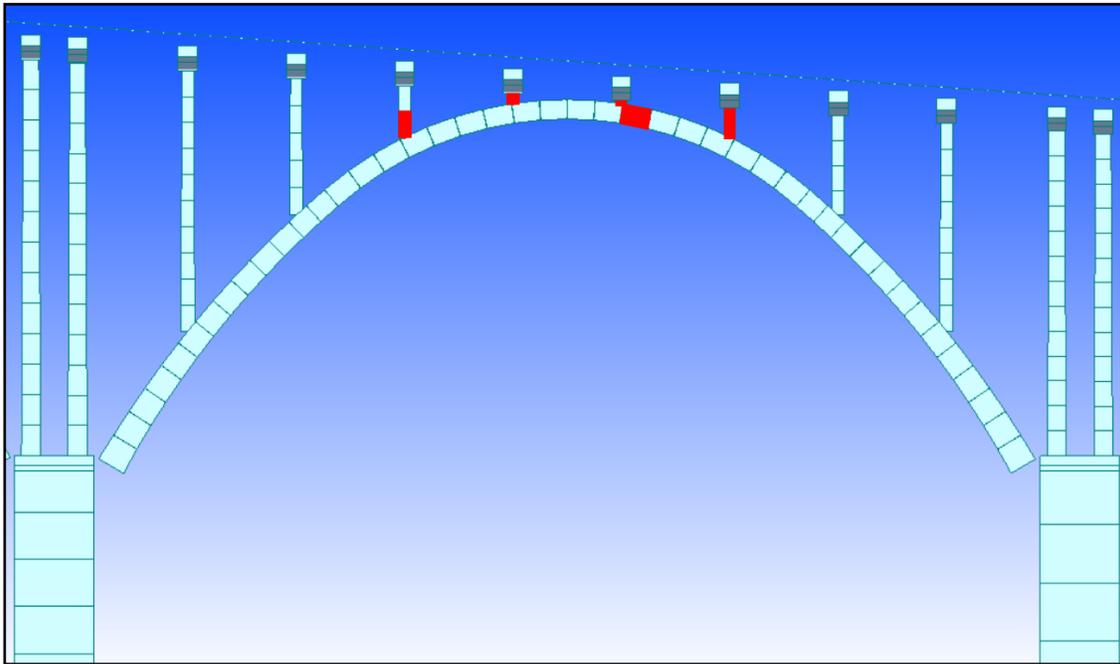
Figure J. Arch Span B with cracked arch rib and spandrel column elements in red
